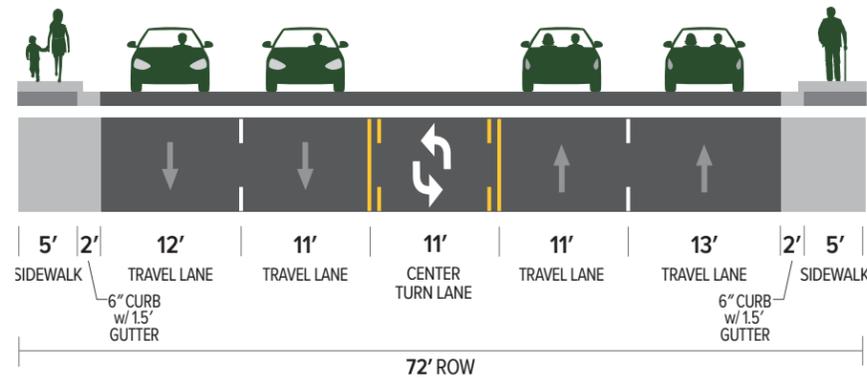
NORWOOD AVENUE TYPICAL EXISTING CROSS SECTION
